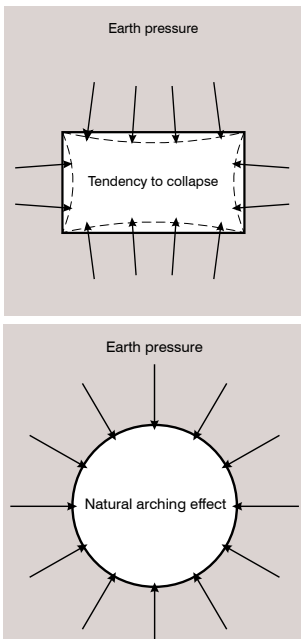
It is easier to excavate a circular pit and a circular excavation is more stable
